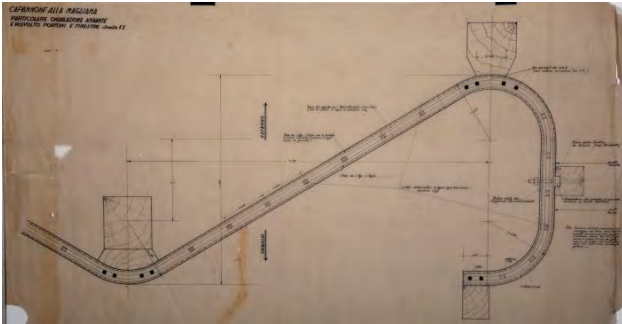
Magliana Warehouse. Ferrocement slab details, s.d. [1944] (CSAC, Centro Studi e Archivio della Comunicazione, Parma: Fondo P.L. Nervi).
